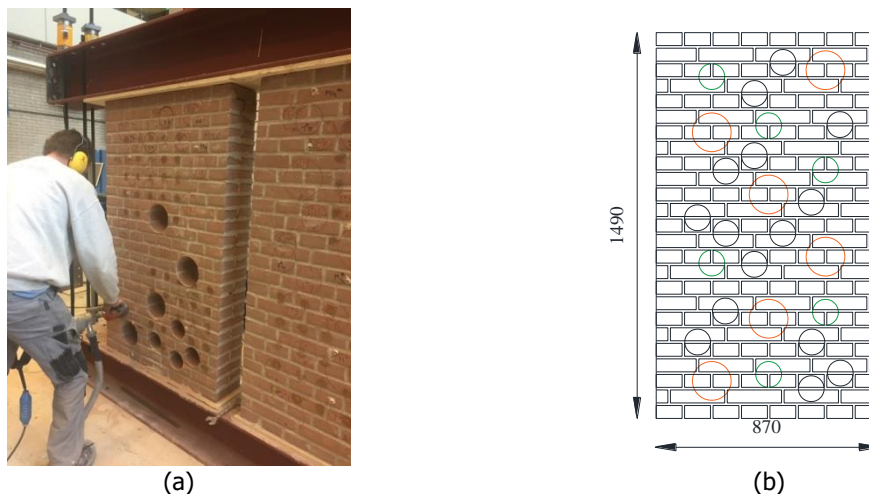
Extraction of masonry cores from the double wythe clay brick masonry wall, dimensions are in mm.
